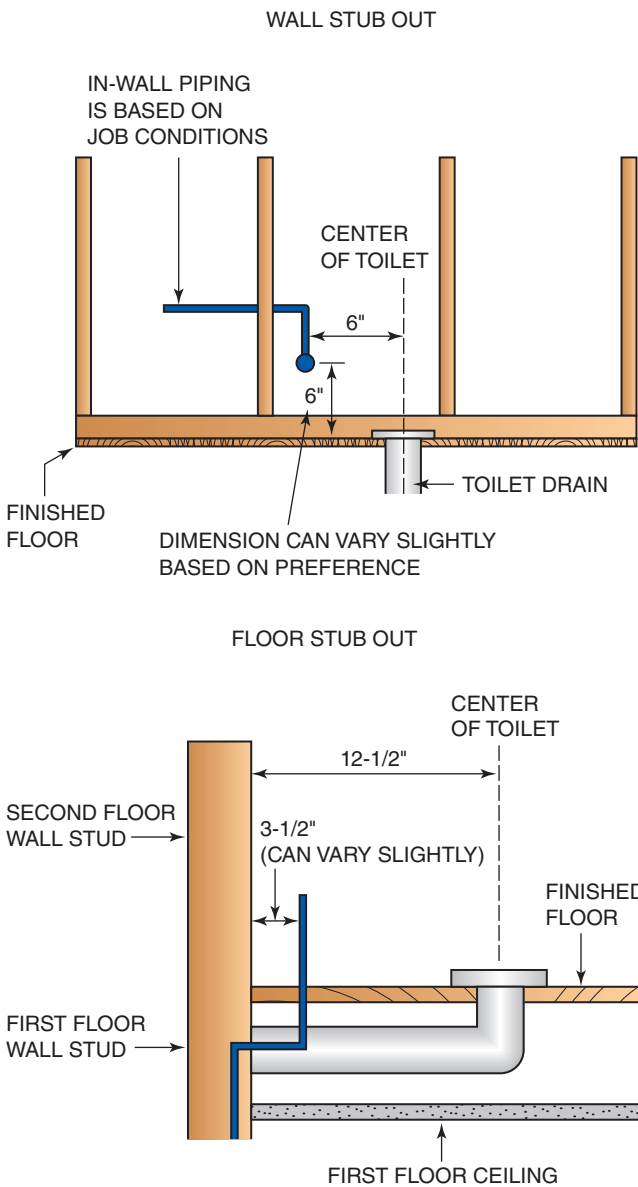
A two-piece toilet has a standard stub-out location and varies in height installed above the floor.
